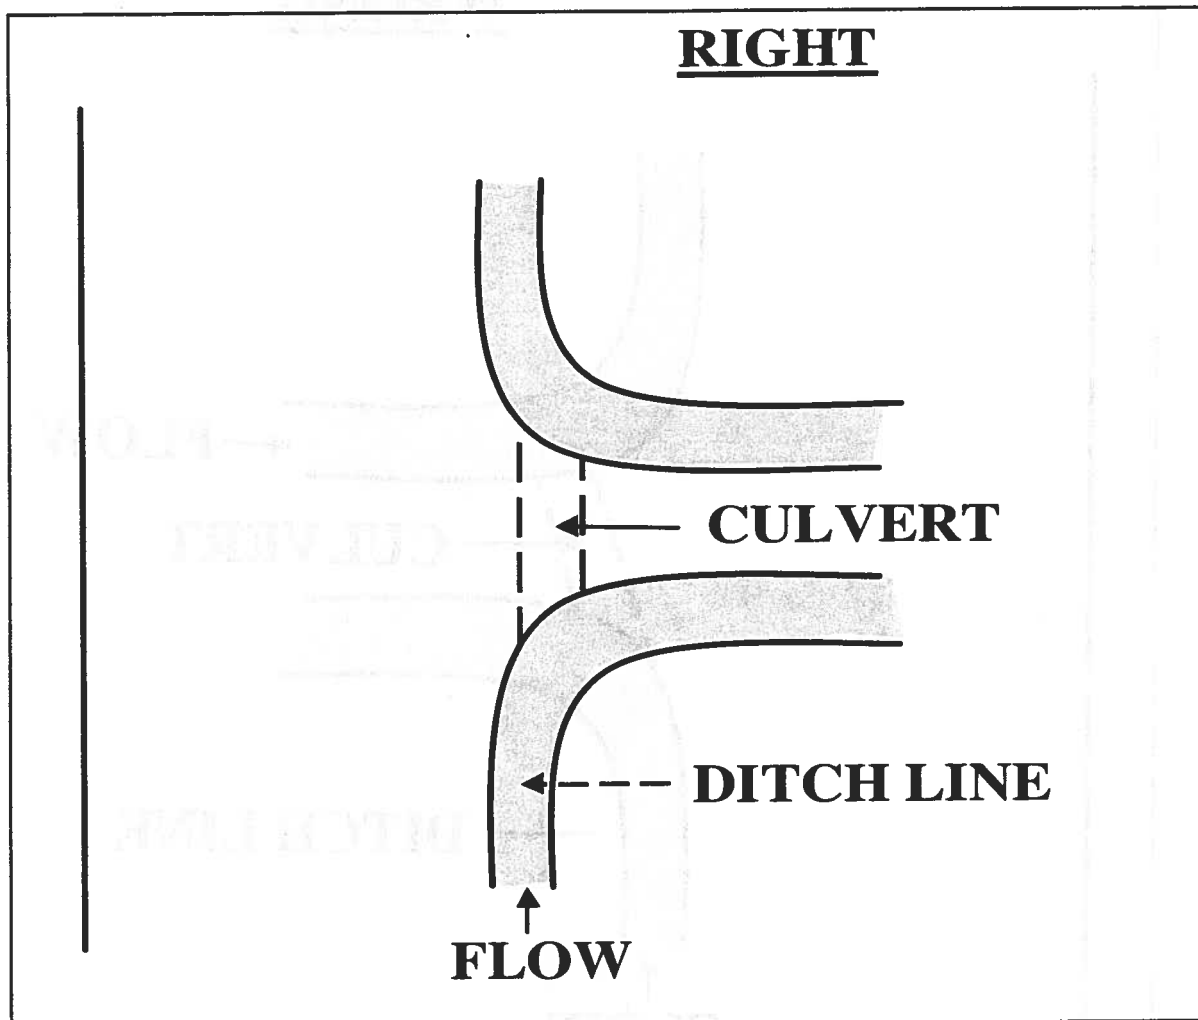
Proper Culvert Placement Under Intersecting Road.
